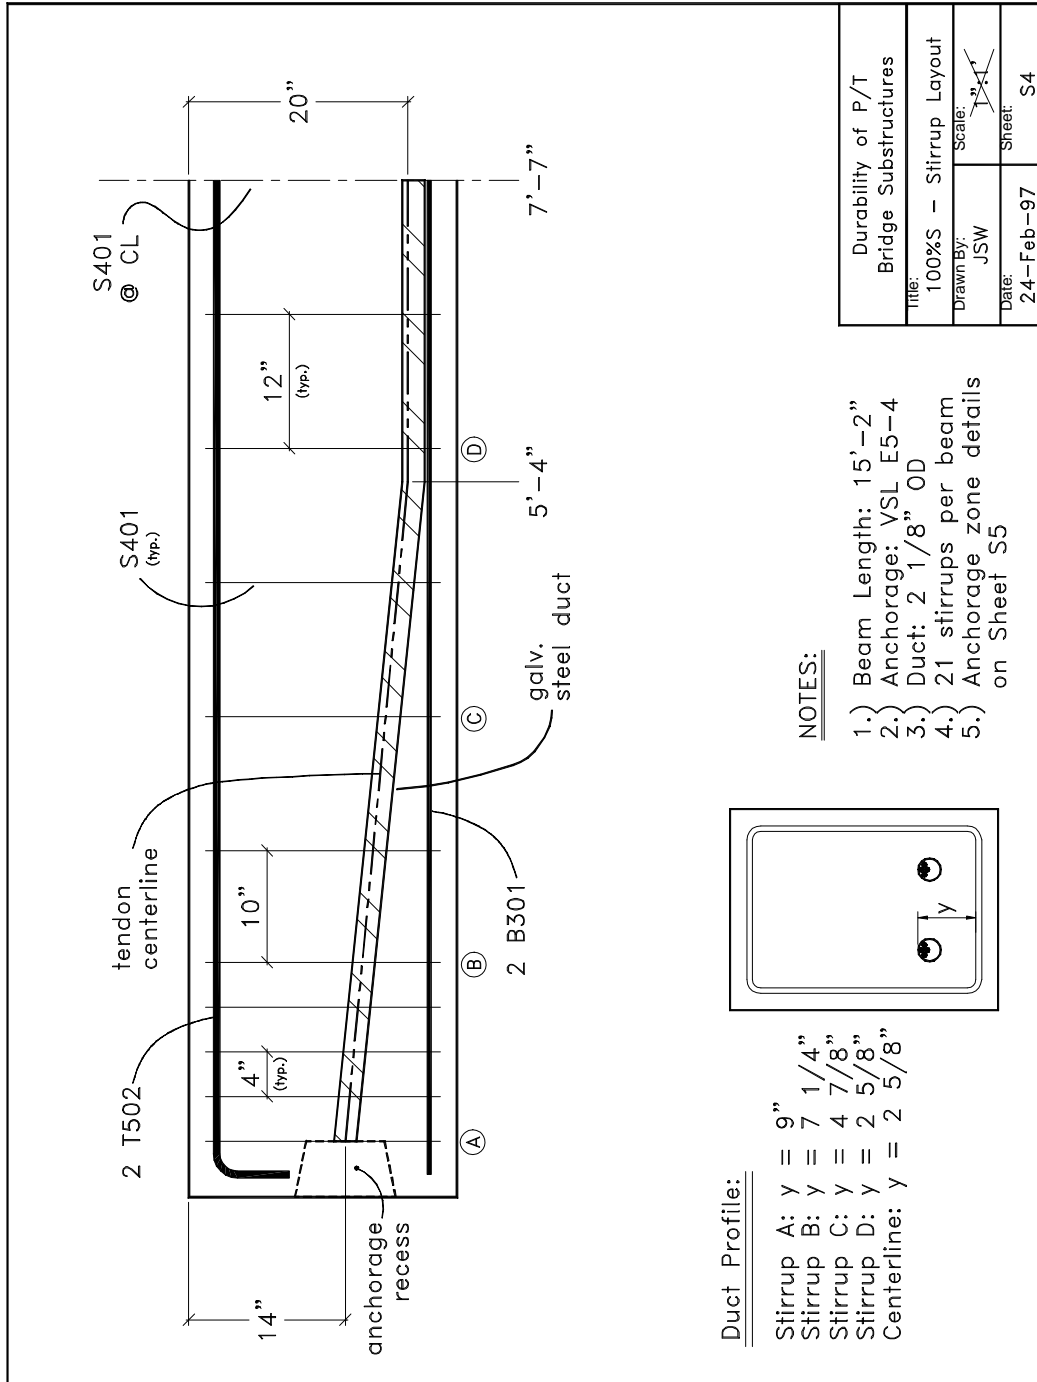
Sheet S4: 100%S Stirrup Layout
